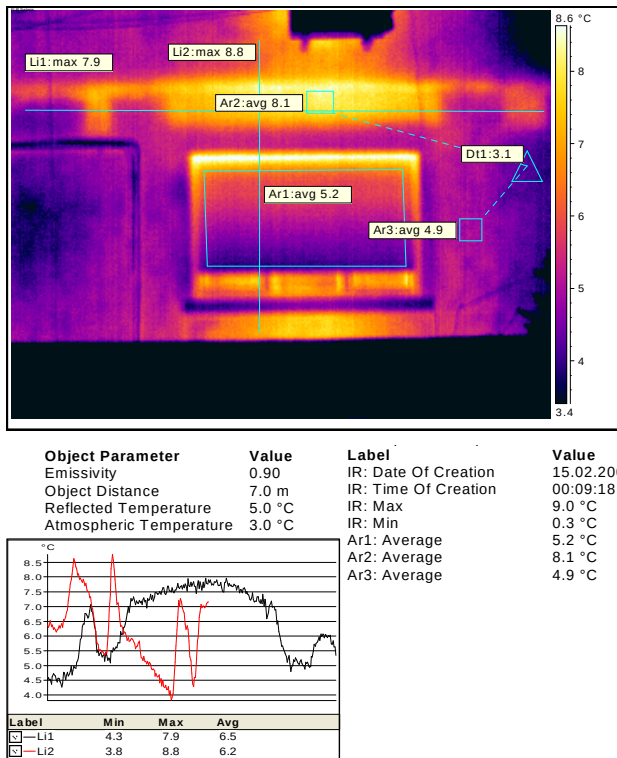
Brick masonry wall – identification of pierced thermal bridges
